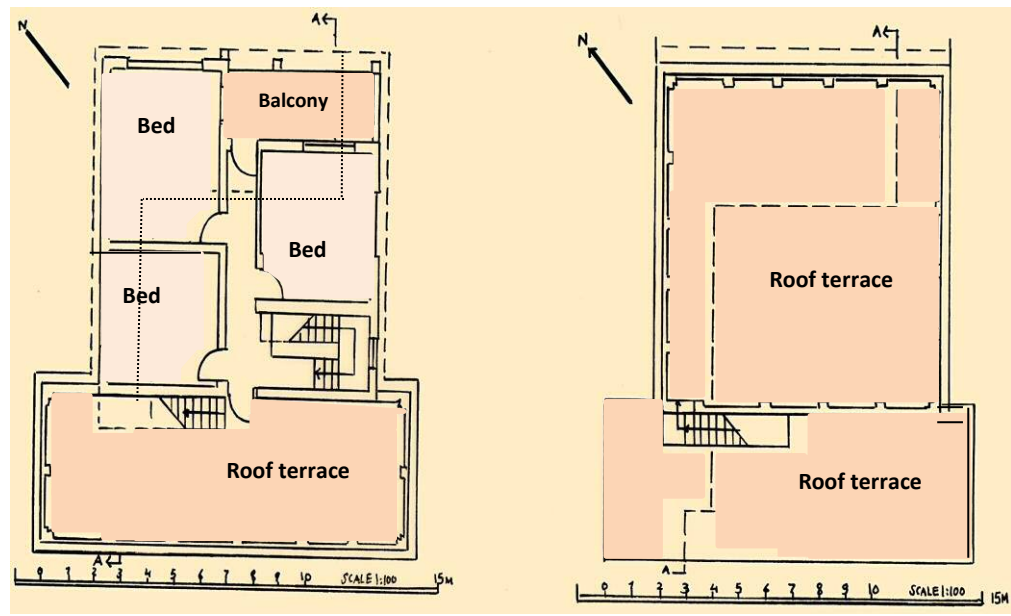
First floor level plan and roof terrace level plan of modern house No. 1. Scale: 1:100
